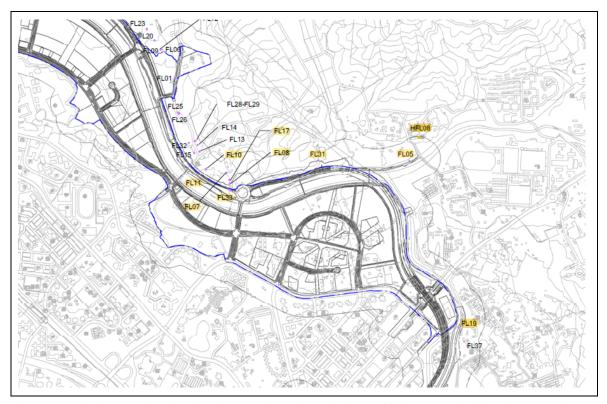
Site layout plan showing the exact locations of the specified ten (10) built heritages which are required to be inspected.
